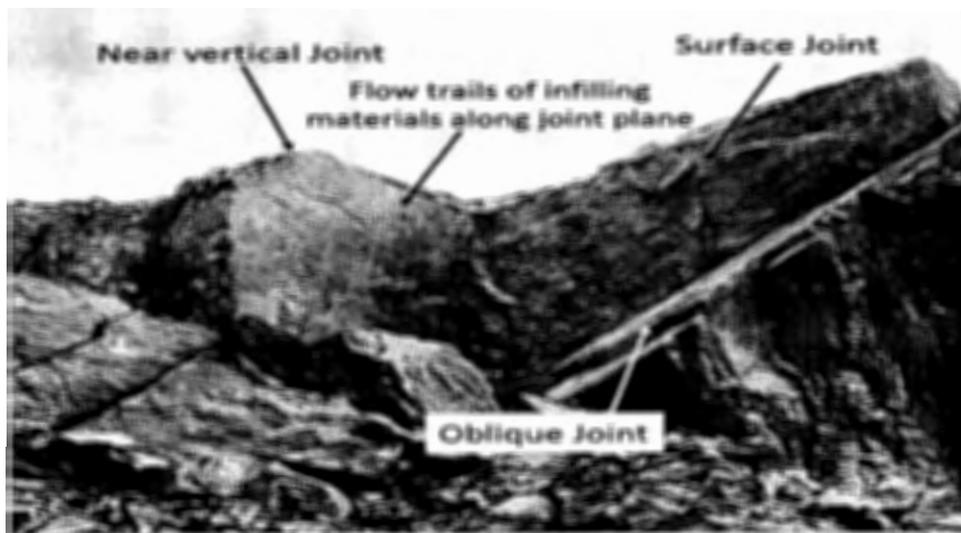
(a): Joint Orientation and observed Staining in Pit No. 37 & 38
